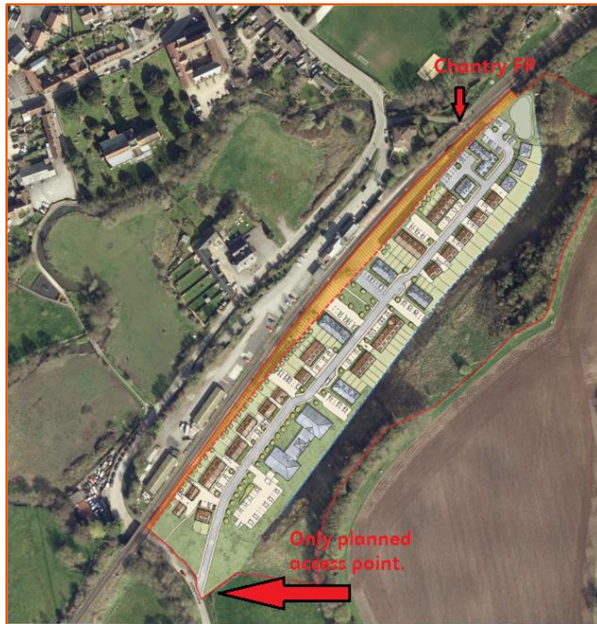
Land set aside for a new platform in current plans for development of the Station Works site
